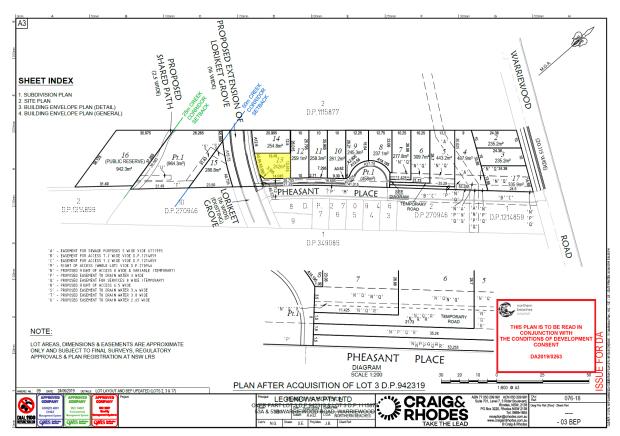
Approved Subdivision Plan DA2019/0263 with Lot 13 highlighted in yellow Source: Northern Beaches Council
